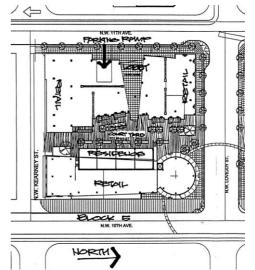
Sketchy plan presented at Pre-application Conference.
